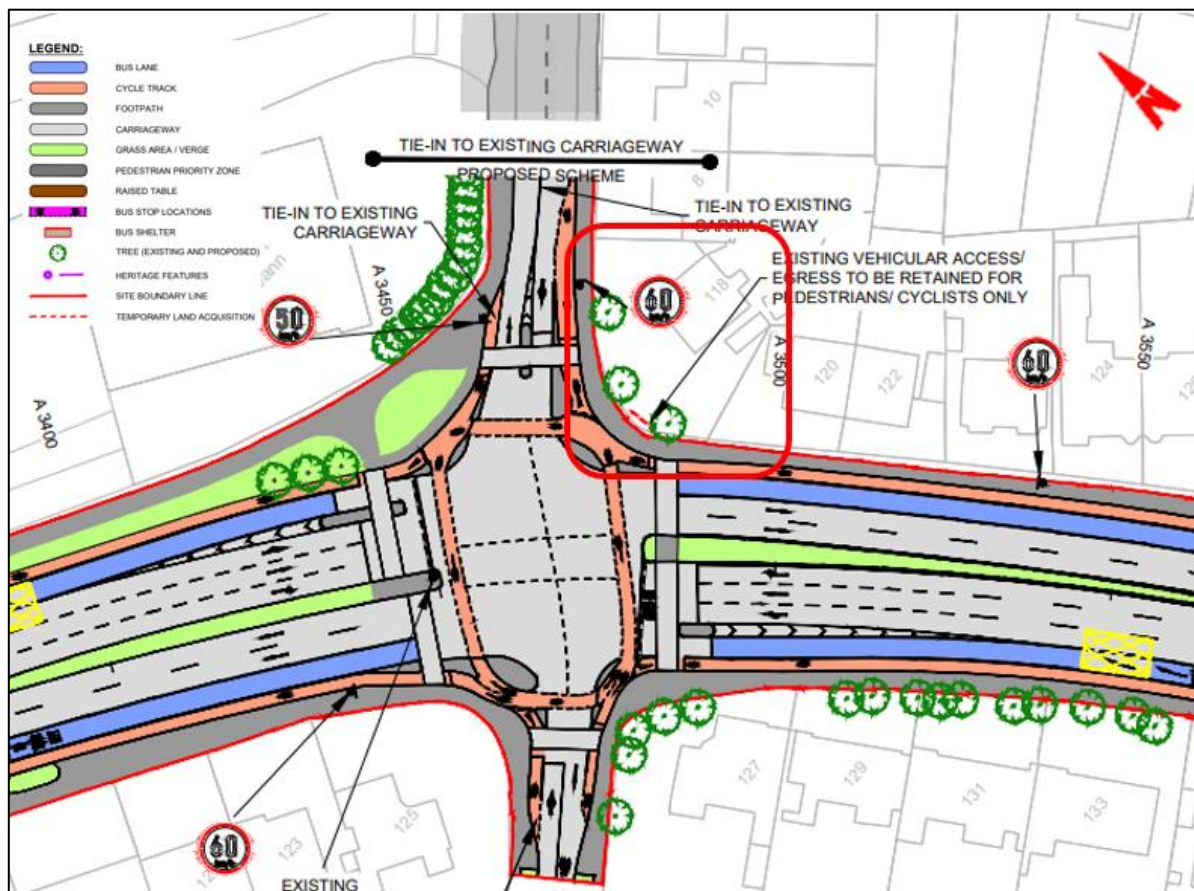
General Arrangement Drawing at 118 Stillorgan Road (Sheet 11)
